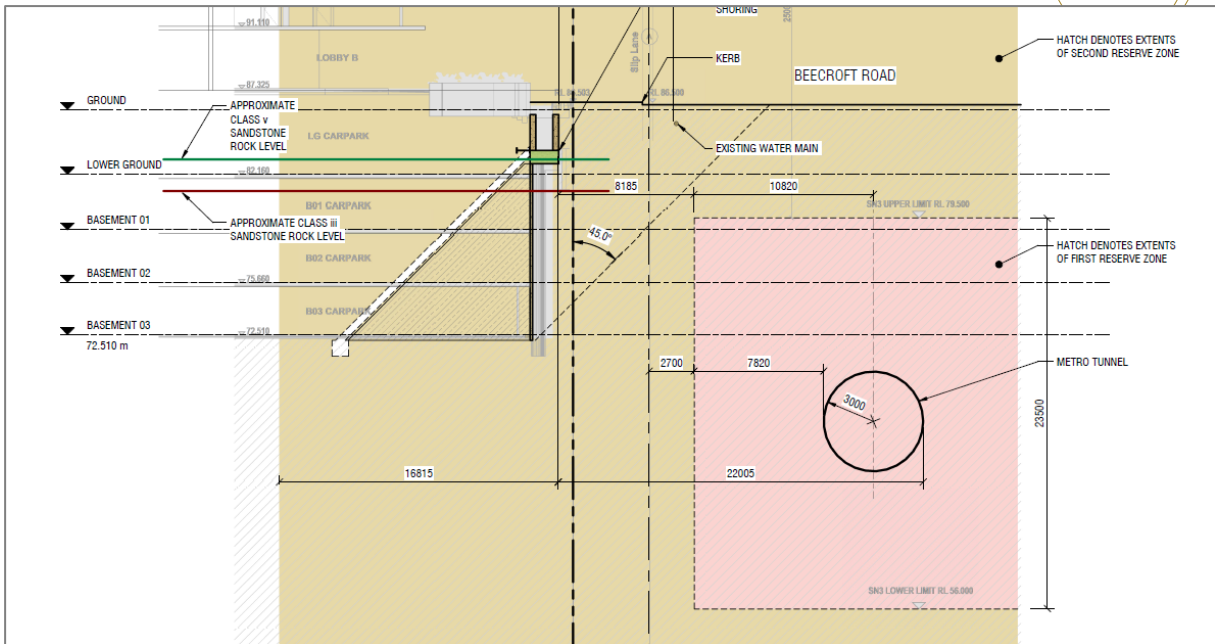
Section showing the excavation and proximity to the Tunnel and Reserves.
